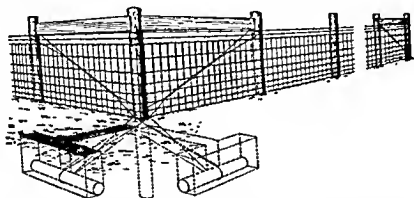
Corner Post. This drawing shows how to brace and anchor a corner post.
